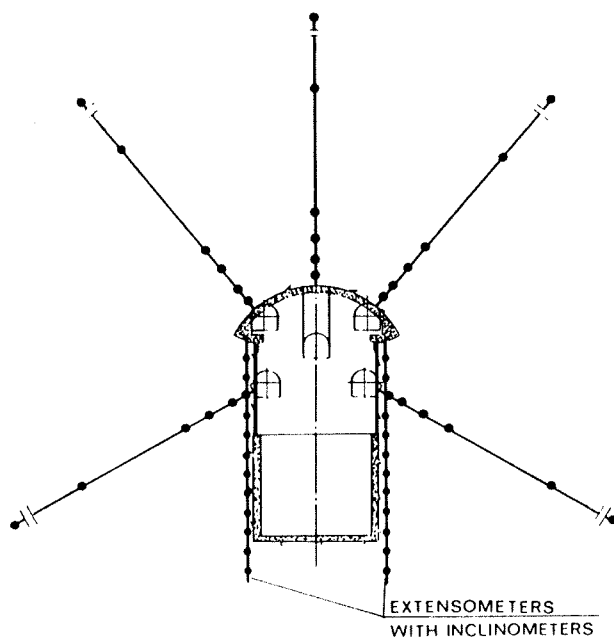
Scheme of multi-base extensometers to be installed around the excavation of the machine hall.
